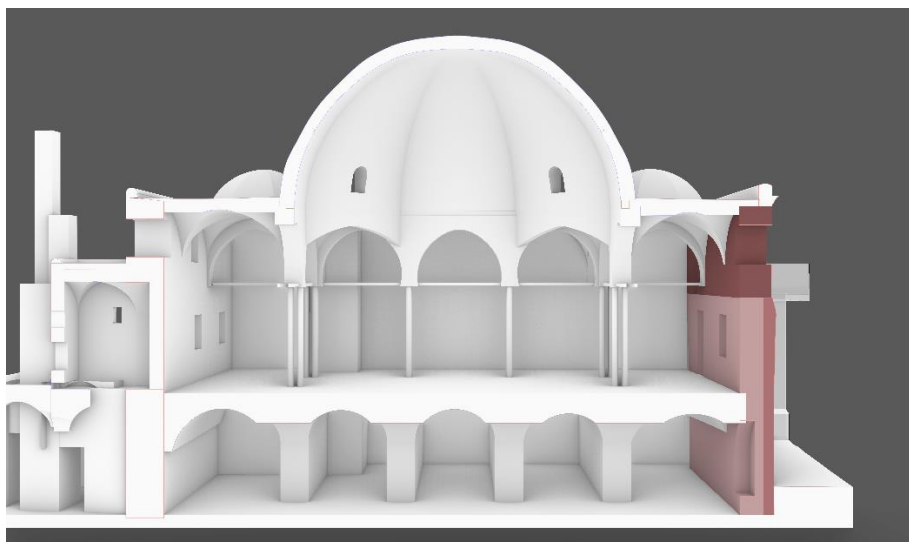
Reconstruction of the north-east wall: the interior wall (in pink) and the upper-storey wall (in dark garnet) date from 1818. The exterior wall (in light garnet) predates this construction.
